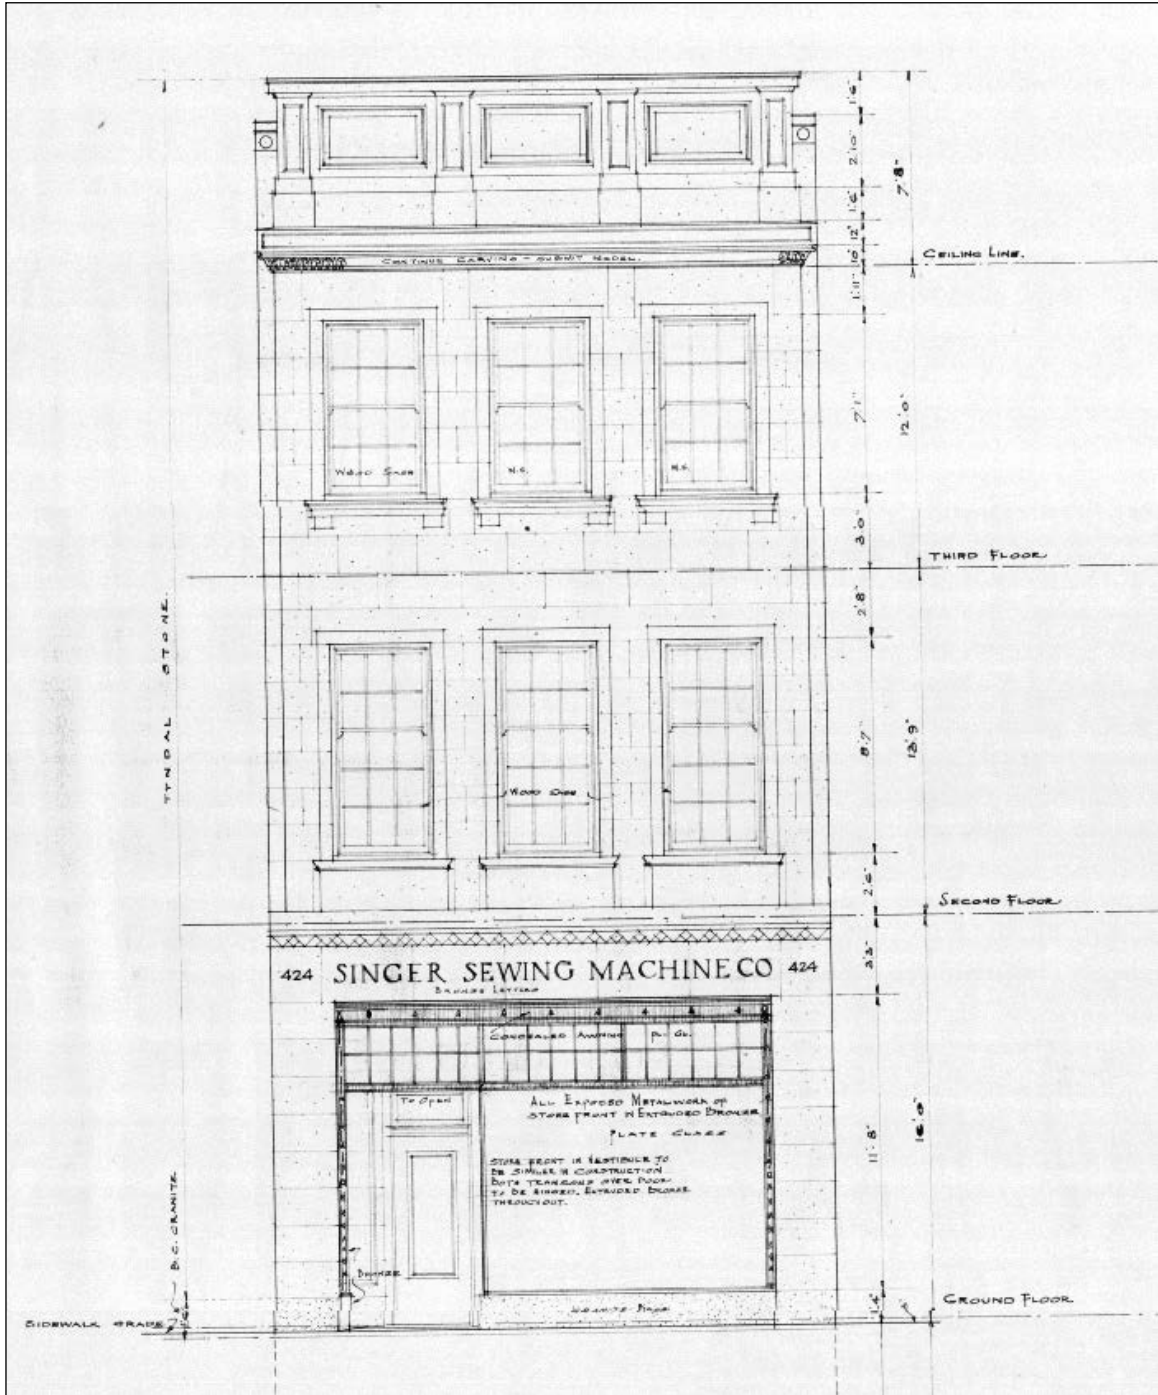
Architect’s plans, “Front Elevation,” Singer Sewing Machine Building, Portage Avenue, 1929. (City of Winnipeg, Plan #4755/1929.)
